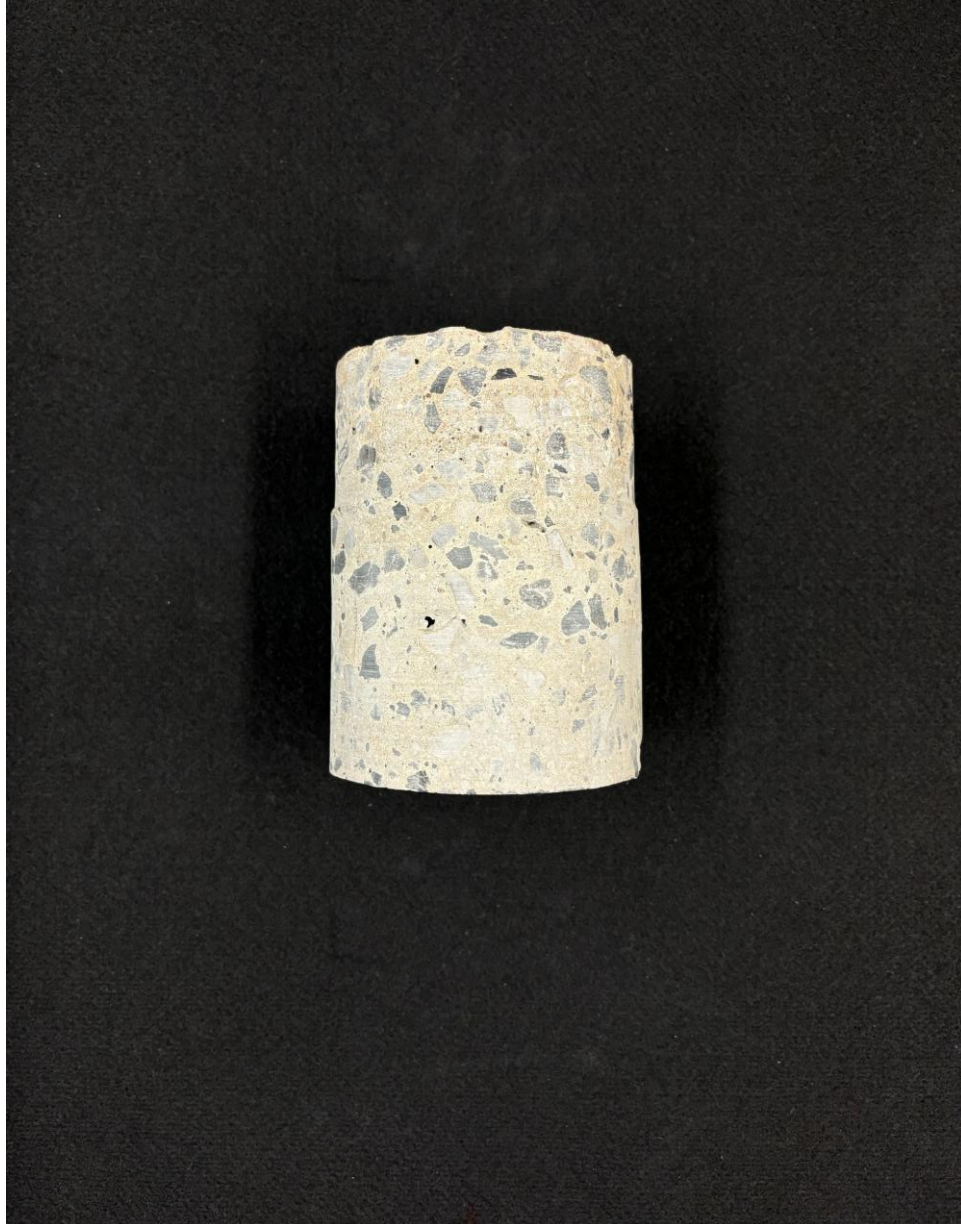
Core 2 of lightweight concrete deck at bridge C-1011.
